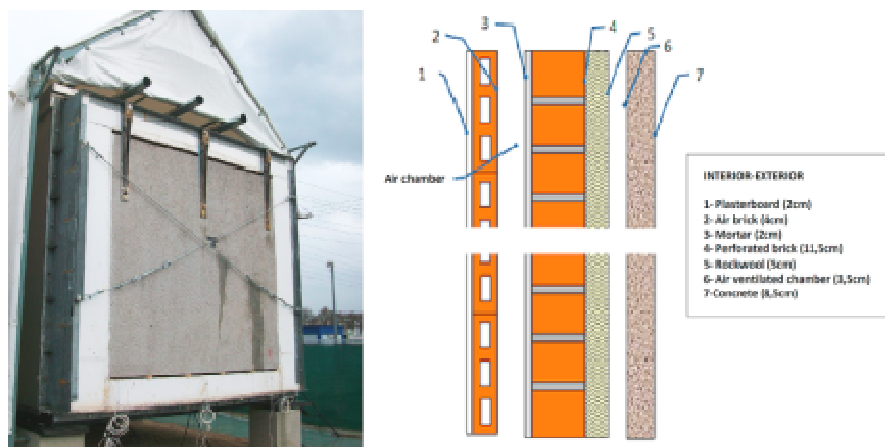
Heavy concrete sheet and the sample in the test cell (left) and constructive solution of heavy ventilated façade sample (right)
